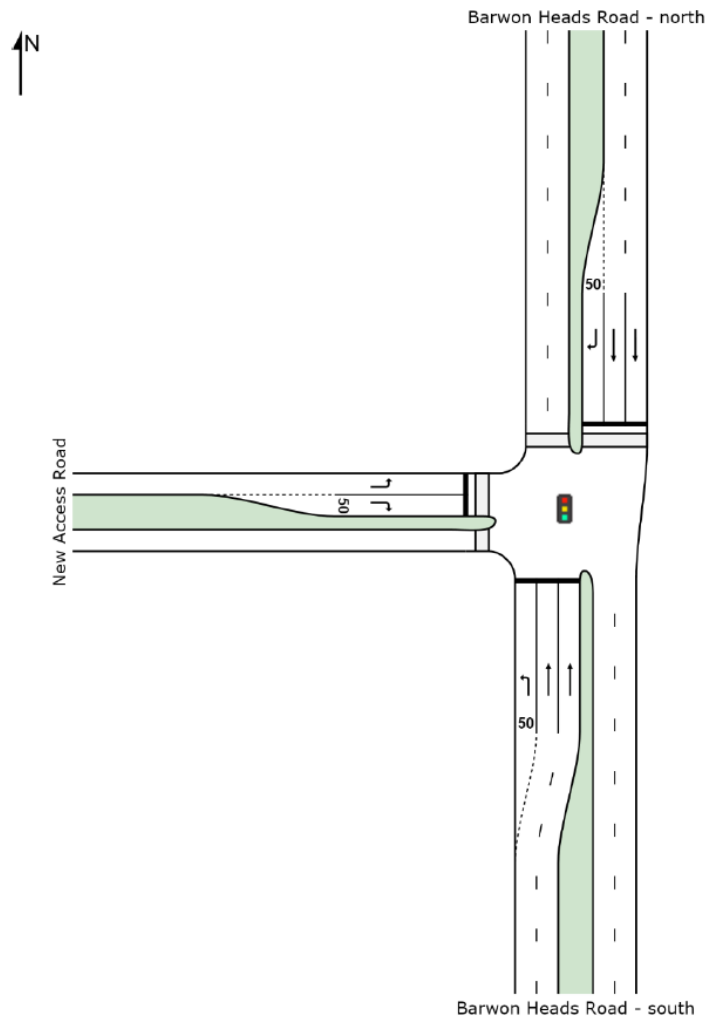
Proposed new Barwon Heads Road / New Access Road – dual carriageway
